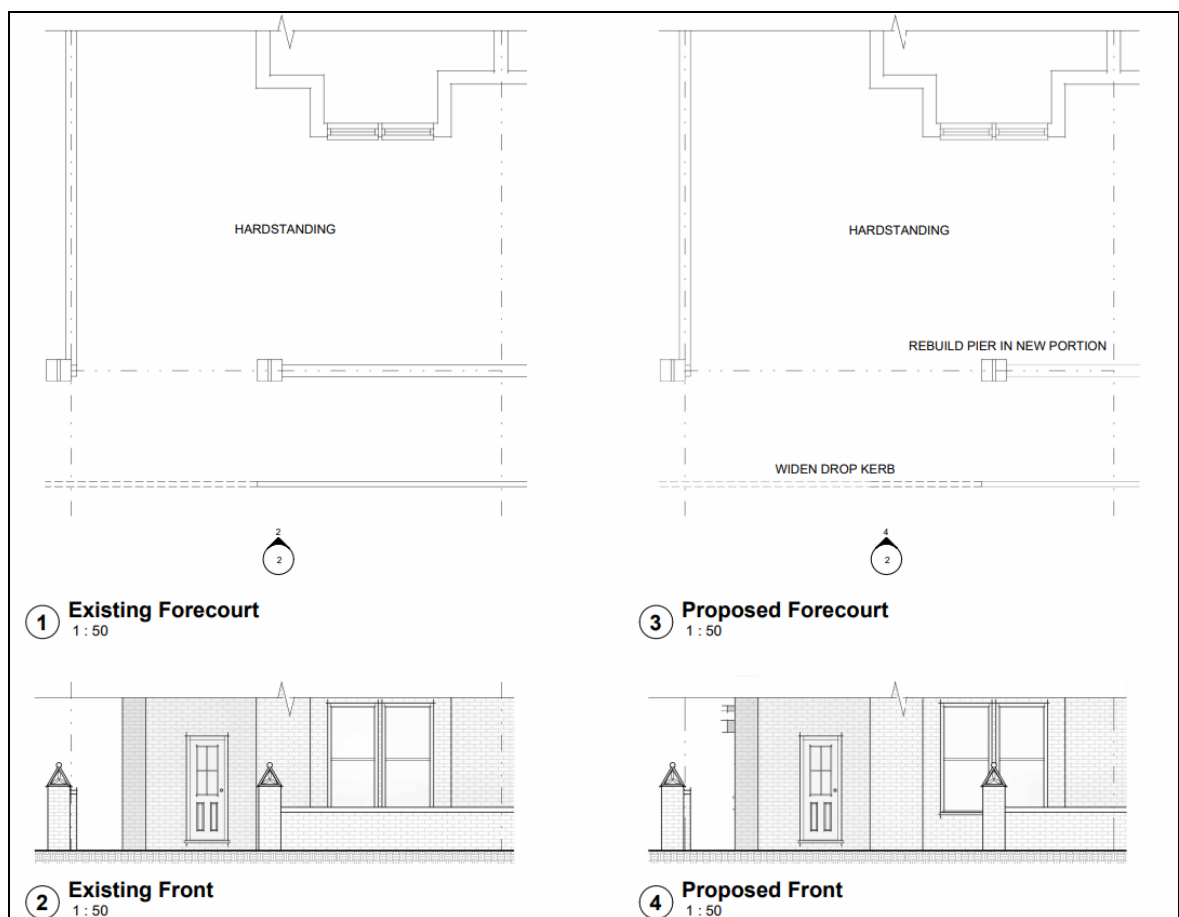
Plans submitted for 13 St David's Road (21/01662/HOU/ APP/Z1775/D/22/3297683)
